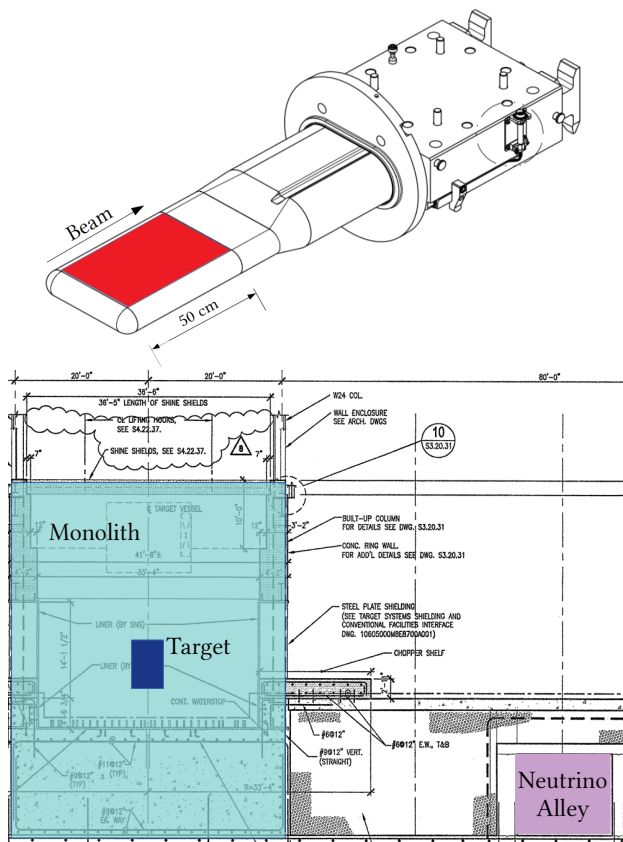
Top: ORNL technical drawing of the target vessel. The red section highlights the main Hg target as implemented in our Geant4 model. Bottom: A portion of an ORNL technical drawing illustrating the target hall, with pieces in our Geant4 model highlighted. The outer shaded cyan is the concrete monolith, with the inner indigo representing the steel containing the Hg target and moderators. In the bottom right corner, the shaded purple shows the location of Neutrino Alley relative to the target monolith [51].
